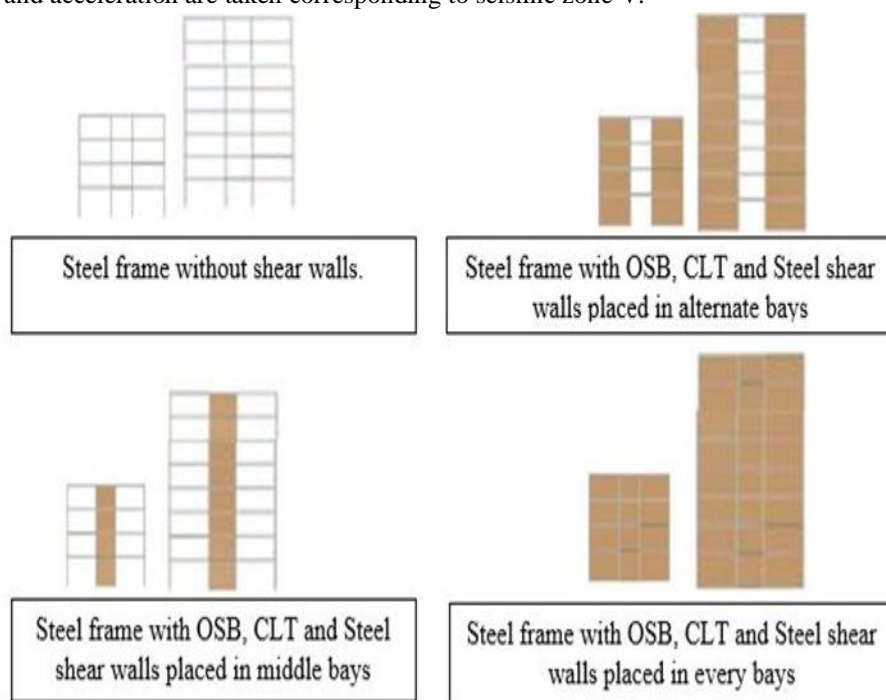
Shows Models of (G+3) and (G+7) Wood Steel Hybrid Buildings
